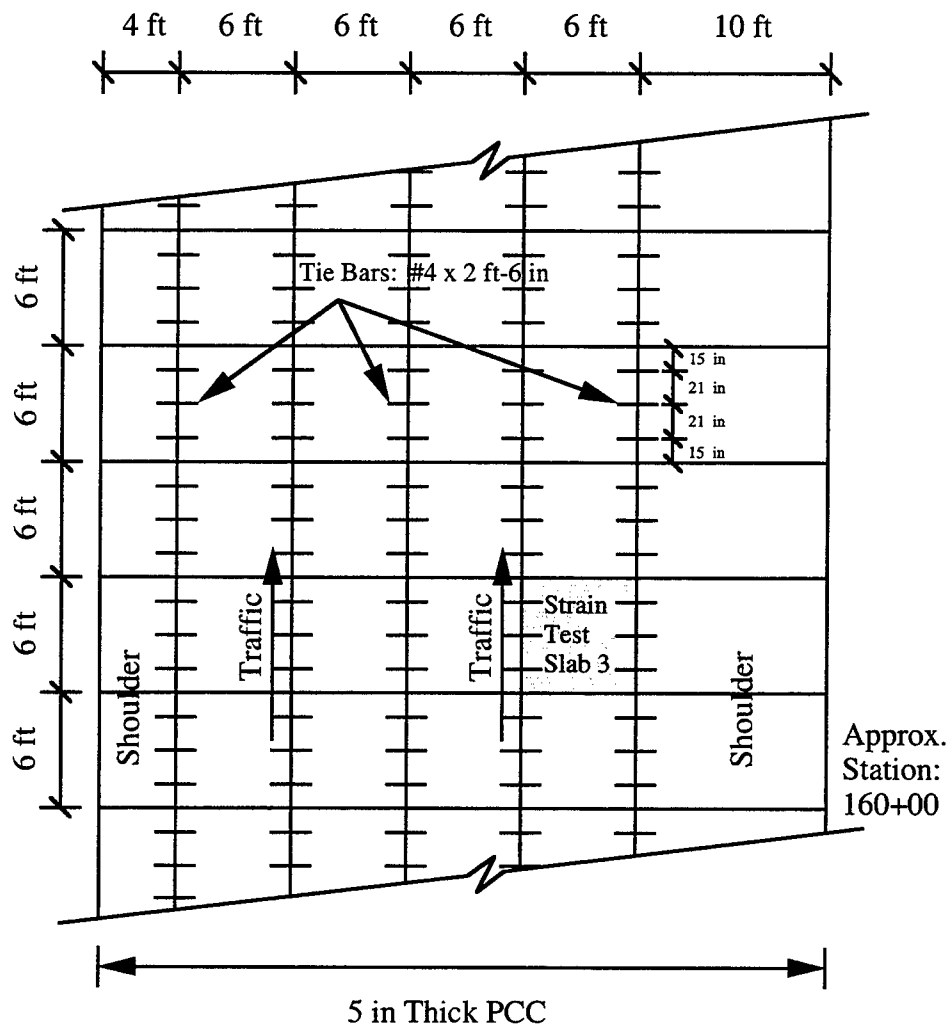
Test Slab 3 Layout for CDOT Project #2.
